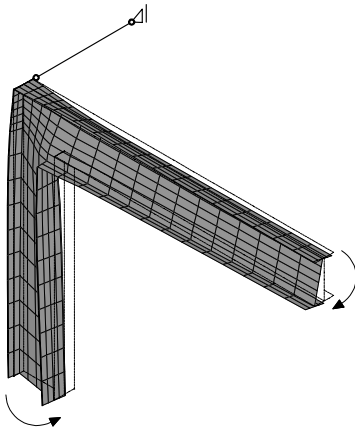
Frame corner without stiffeners – failure mode: Buckling of the inner corner
